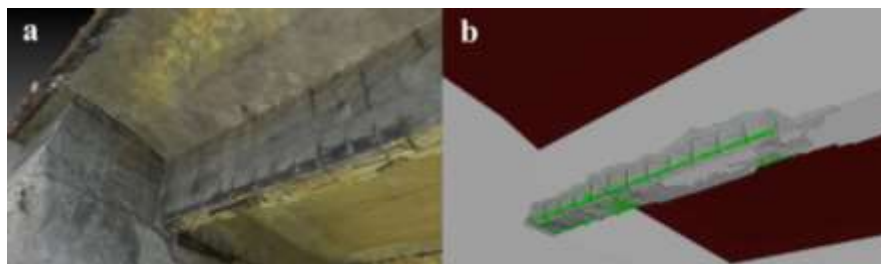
An example of damage detection - concrete spalling on a bridge girder: a) photogrammetric mesh, b) Bridge Information Model BrIM; a bridge in Serbia [14]
